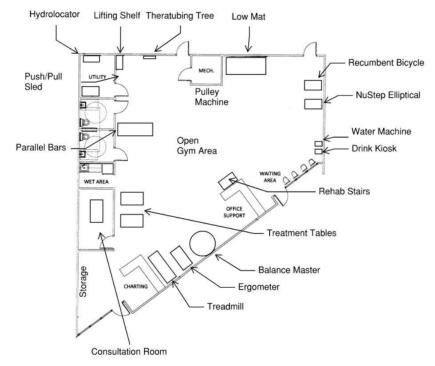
Floor Plan of ARC Physical Therapy tenant space.
